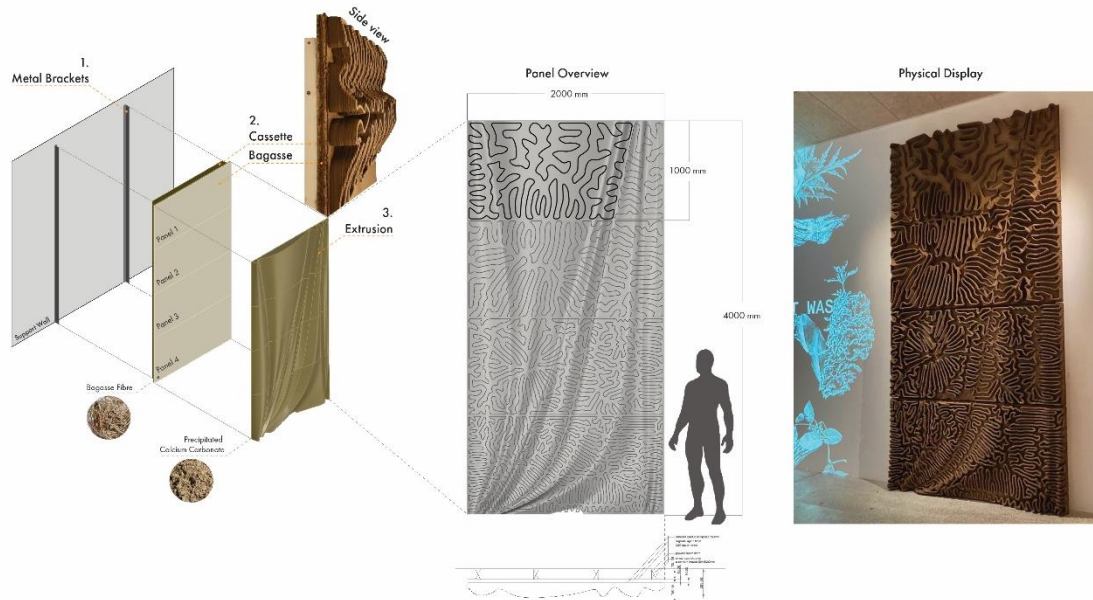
Panel Structure diagram (left); and photo of elevation (right).
